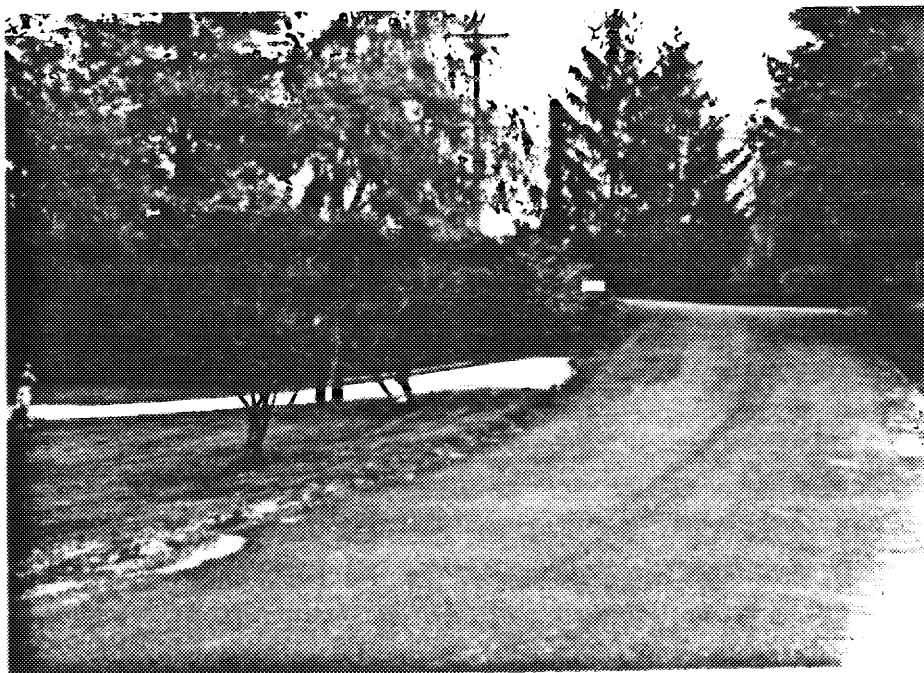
Downstream face of dam and Alan Road. (West Dike).
